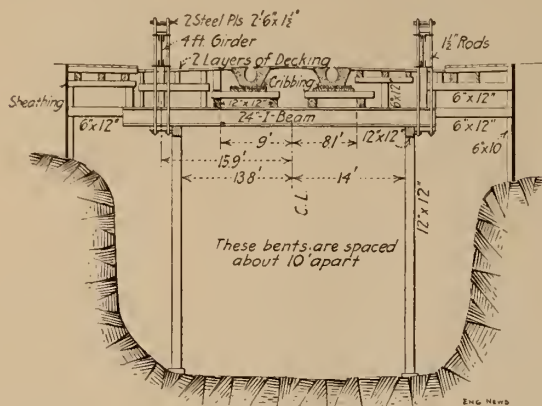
TIMBERING FOR ROCK EXCAVATION FOR DOUBLE-DECK SUBWAY, LEXINGTON AVE., BETWEEN 78TH AND 79TH ST., SECTION 9.
